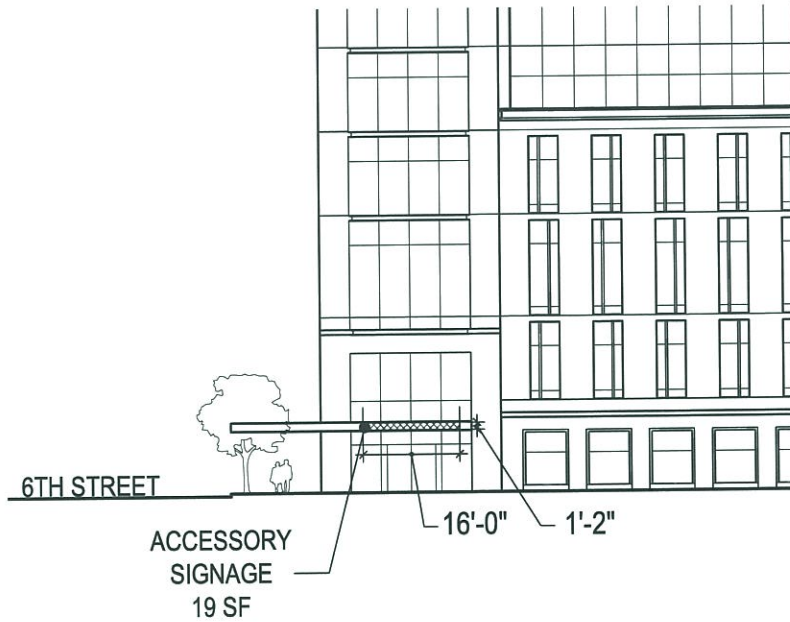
SOUTH ELEVATION (6TH STREET)
